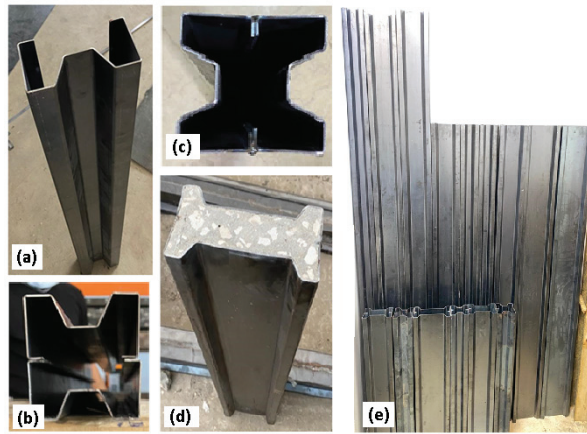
Specimens manufacturing process (a) Forming sigma sections, (b) assembling column section, (c) welding the two stigmas, (d) casting concrete and (e) all fabricated steel shells.
